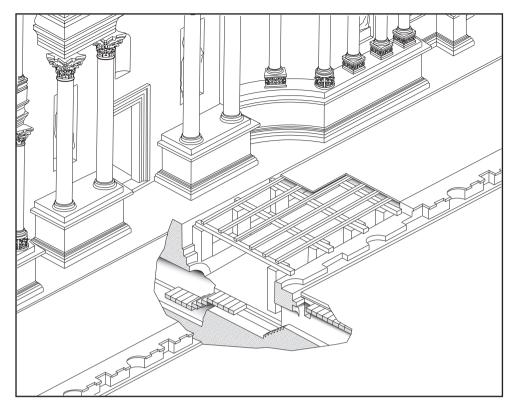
Severan Theater: isometric reconstruction of hyposcaenium (below pulpitum floor) containing pilasters and central drainage systems (Stratum 12).
